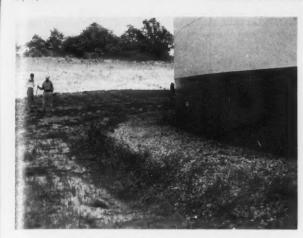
Example of grade designed to reduce corrosion on ground side of tank bottom by keeping the steel surfaces dry and out of contact with corrosive soil. Tank was built on a crushed rock pad 6 inches thick.
